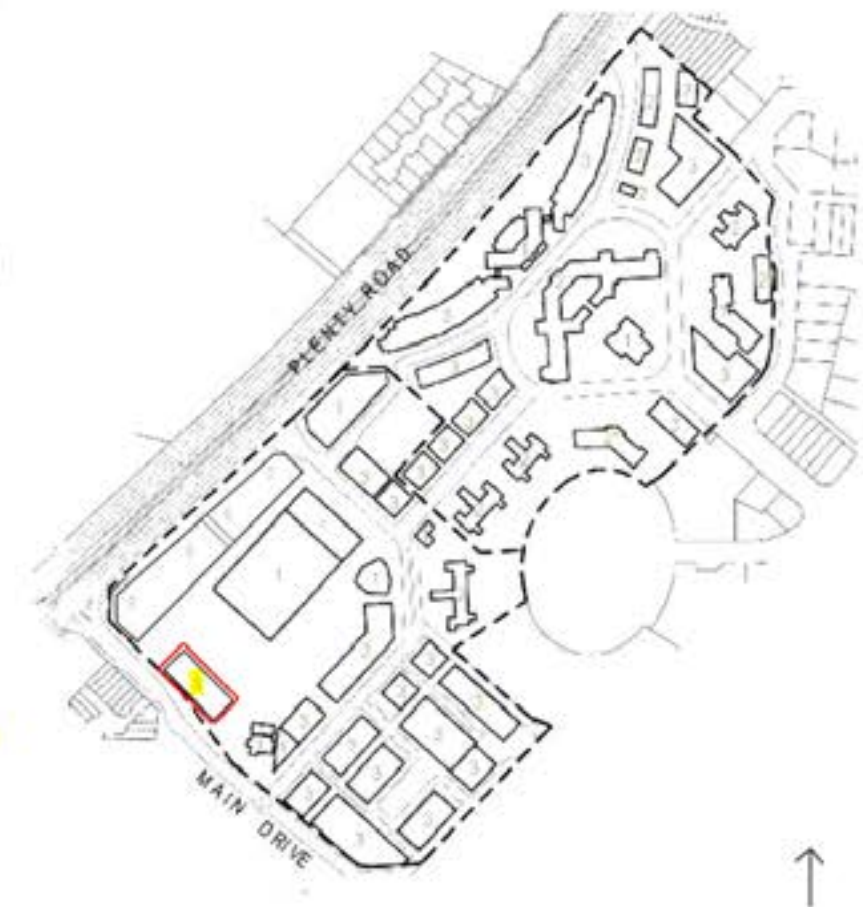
Indicative Conceptual Building Heights above ground (ie storeys)
